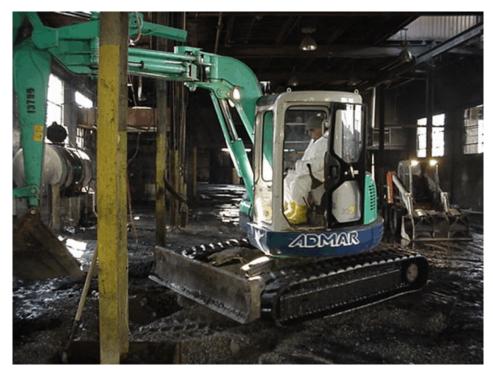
Photograph of the debris stockpiling operation at the Dussault Foundry Site. Photograph taken by Brian Sadowski on April 10, 2003.
